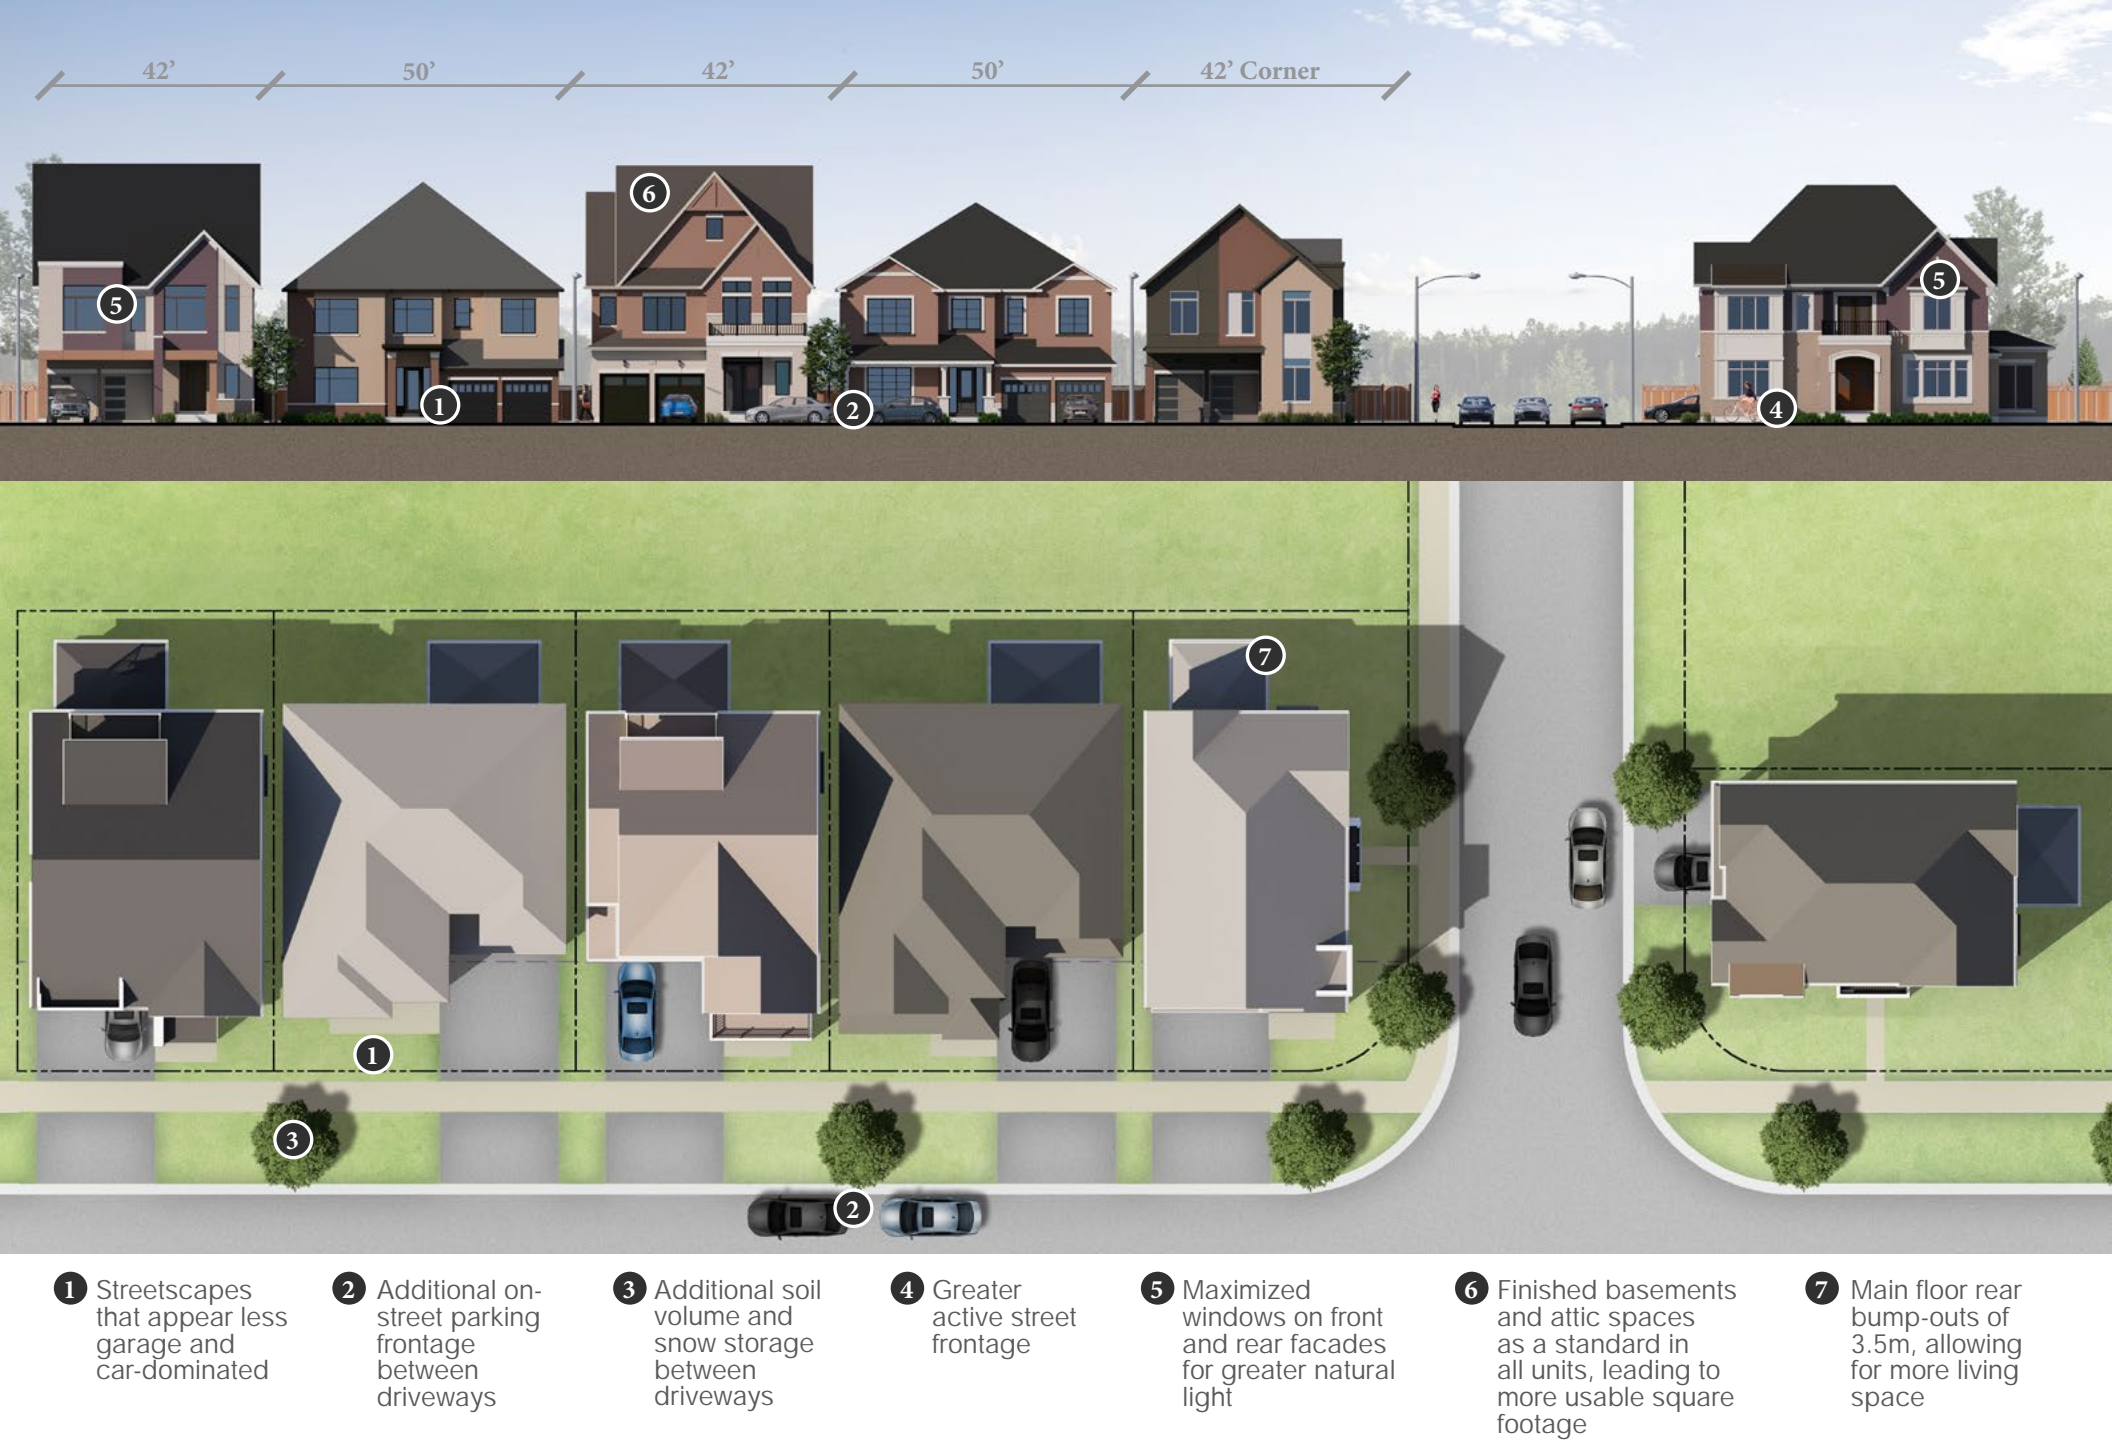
Streetscape elevation and plan demonstrating the benefits of Caivan's OpenPlan™ lots
